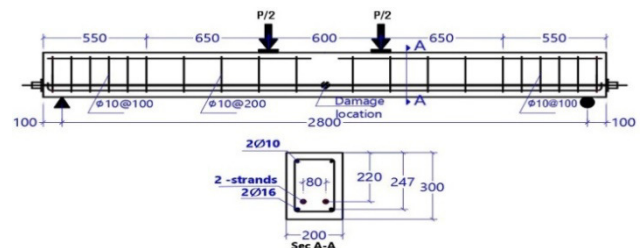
Details of steel reinforcement and girder profile for the tested girders (all dimensions are in mm).
